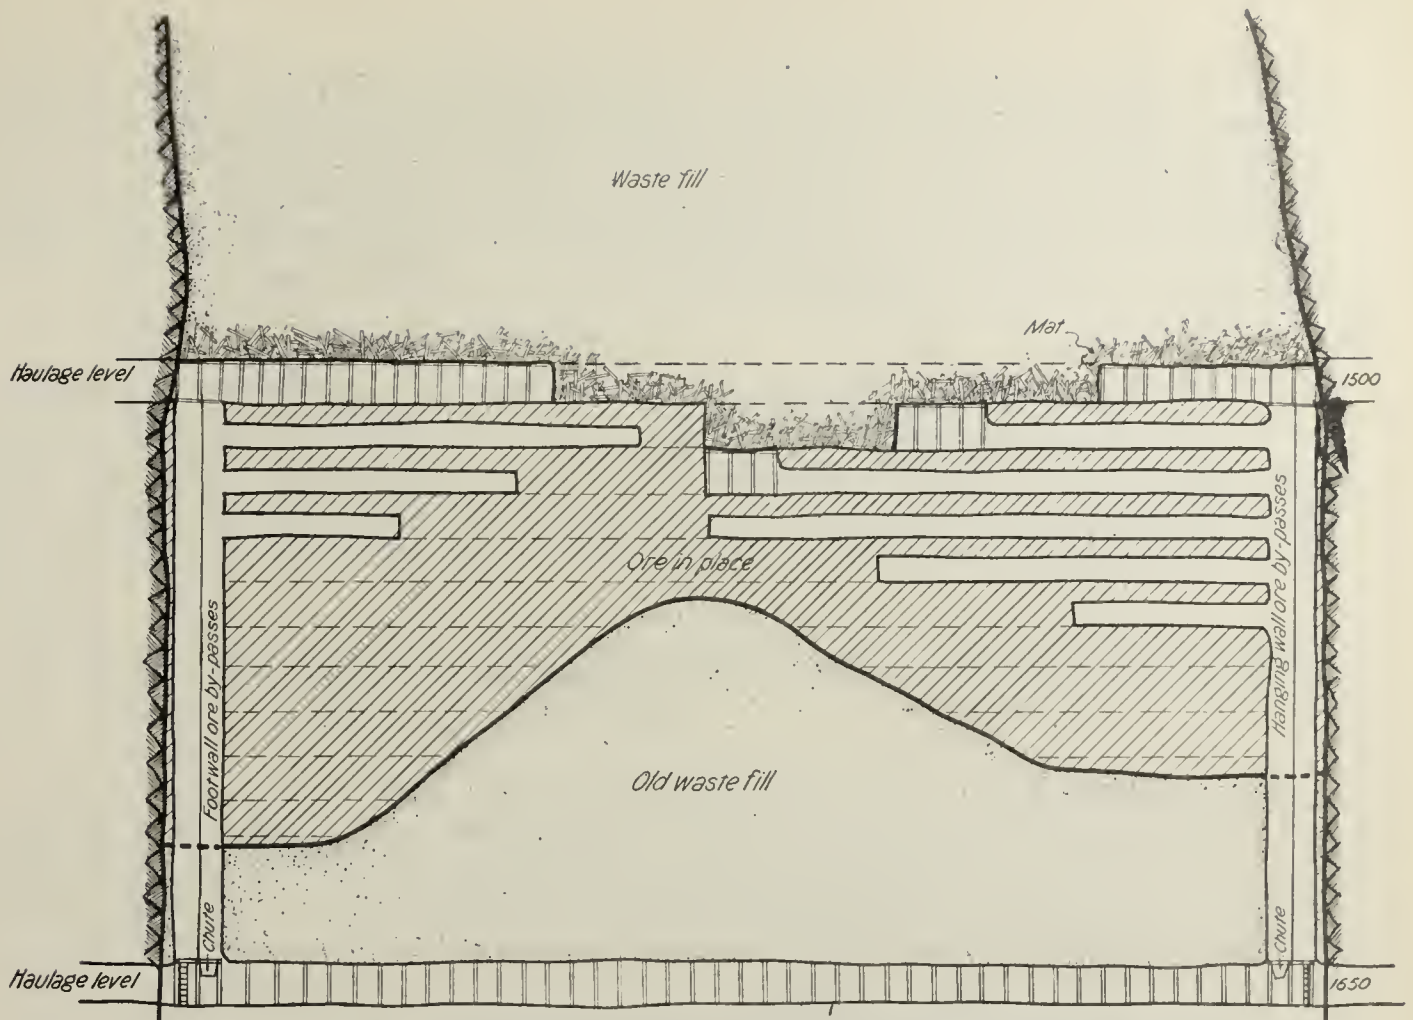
Vertical section through No. 2 top slice stope, section C-D
